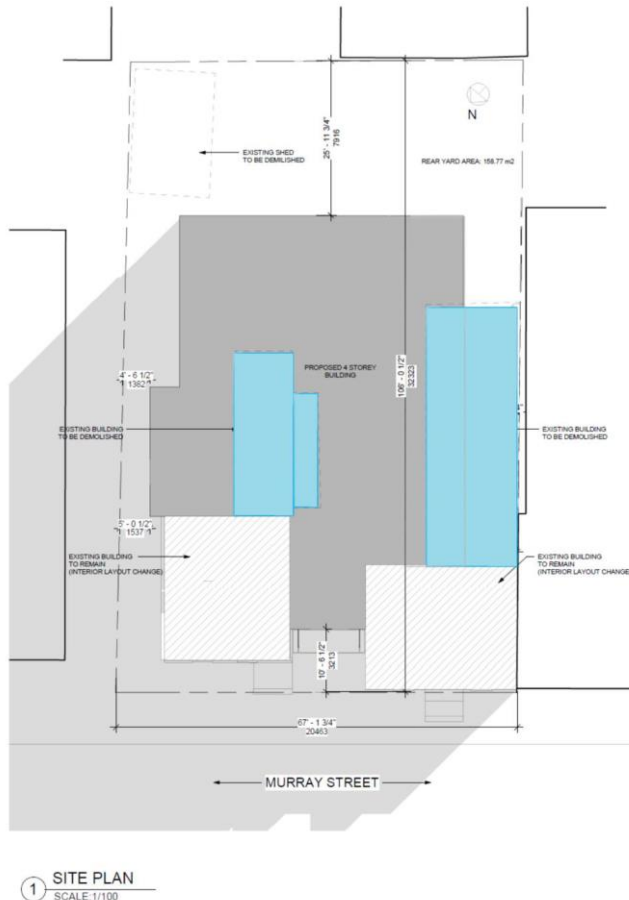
Preliminary site plan of the proposed development. The footprints of the existing buildings have a floor plate of approximately 500sq.ft. (48msq.). Note the relationship of the building at 168 Murray with the adjacent two storey row house illustrating the development footprint. The two existing buildings in light grey and rear sections that will be demolished are in blue. The 4-storey apartment block appears as a darker grey. Source: Ottawa Carleton Construction Group February 2021.
